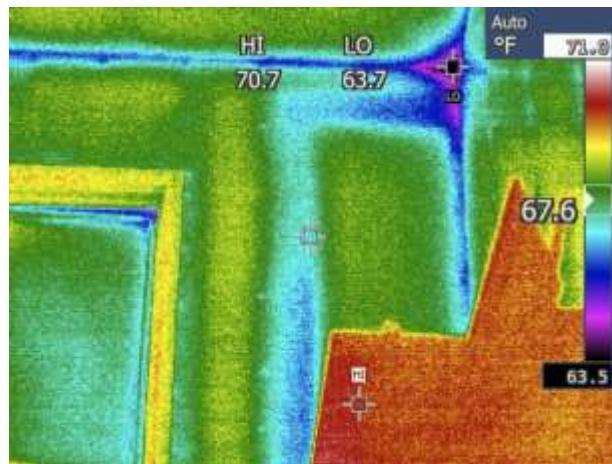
P1 thermal bridge at “strong wall” downstairs
